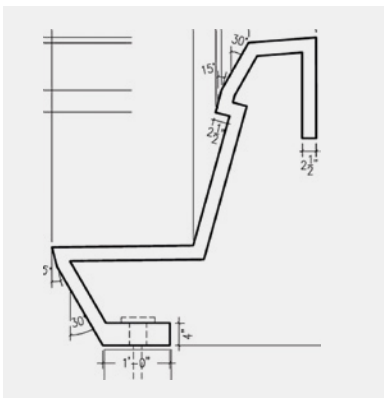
Cross section of bench elements (d = 50-70 mm, 2"-2.8")
